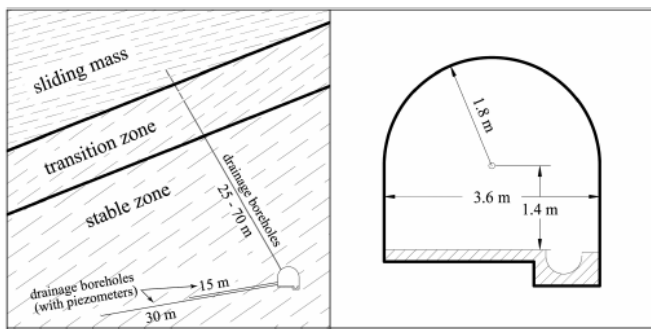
Schematic illustration of the drainage adit design with perforated cased drainage boreholes (left) and adit profile (right) (Eberhardt, Bonzanlgo & Leow, 2007)
